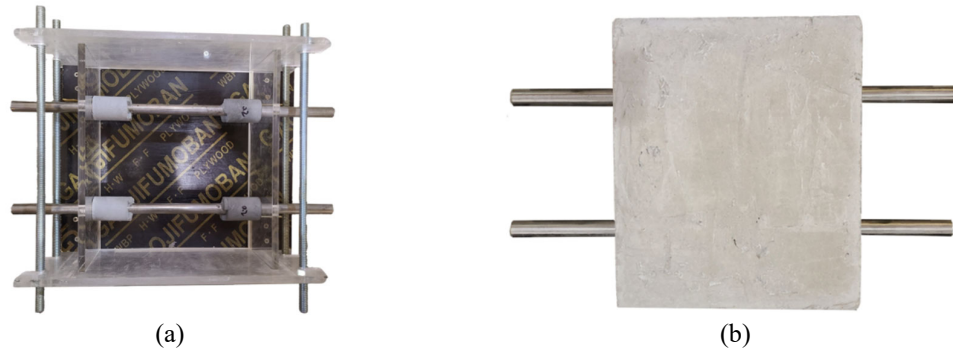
Concrete block casting (a) acrylic formwork with dowel connections and high-strength rings, (b) hardened concrete block with high-strength ring strengthened dowel connections.
